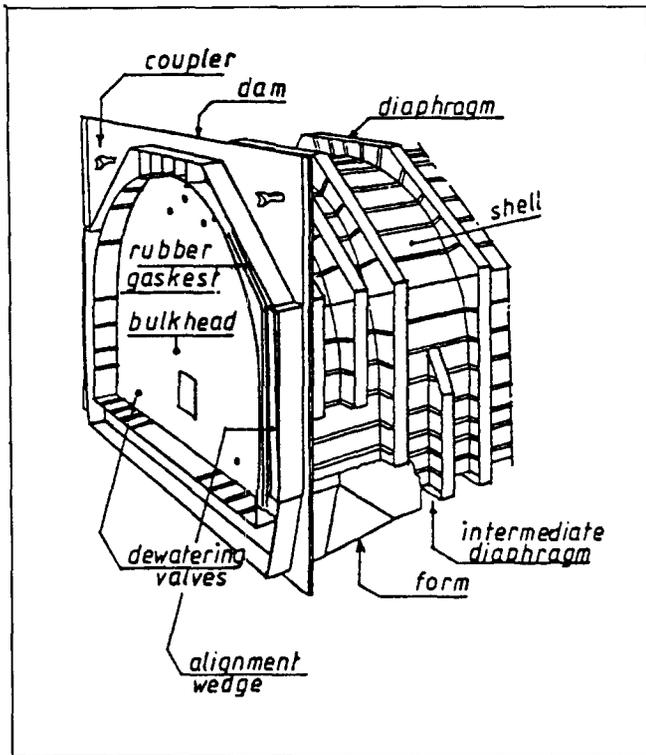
Double-steel-shell element and detail, and typical structural steel arrangement. Formplate is only partially indicated.
